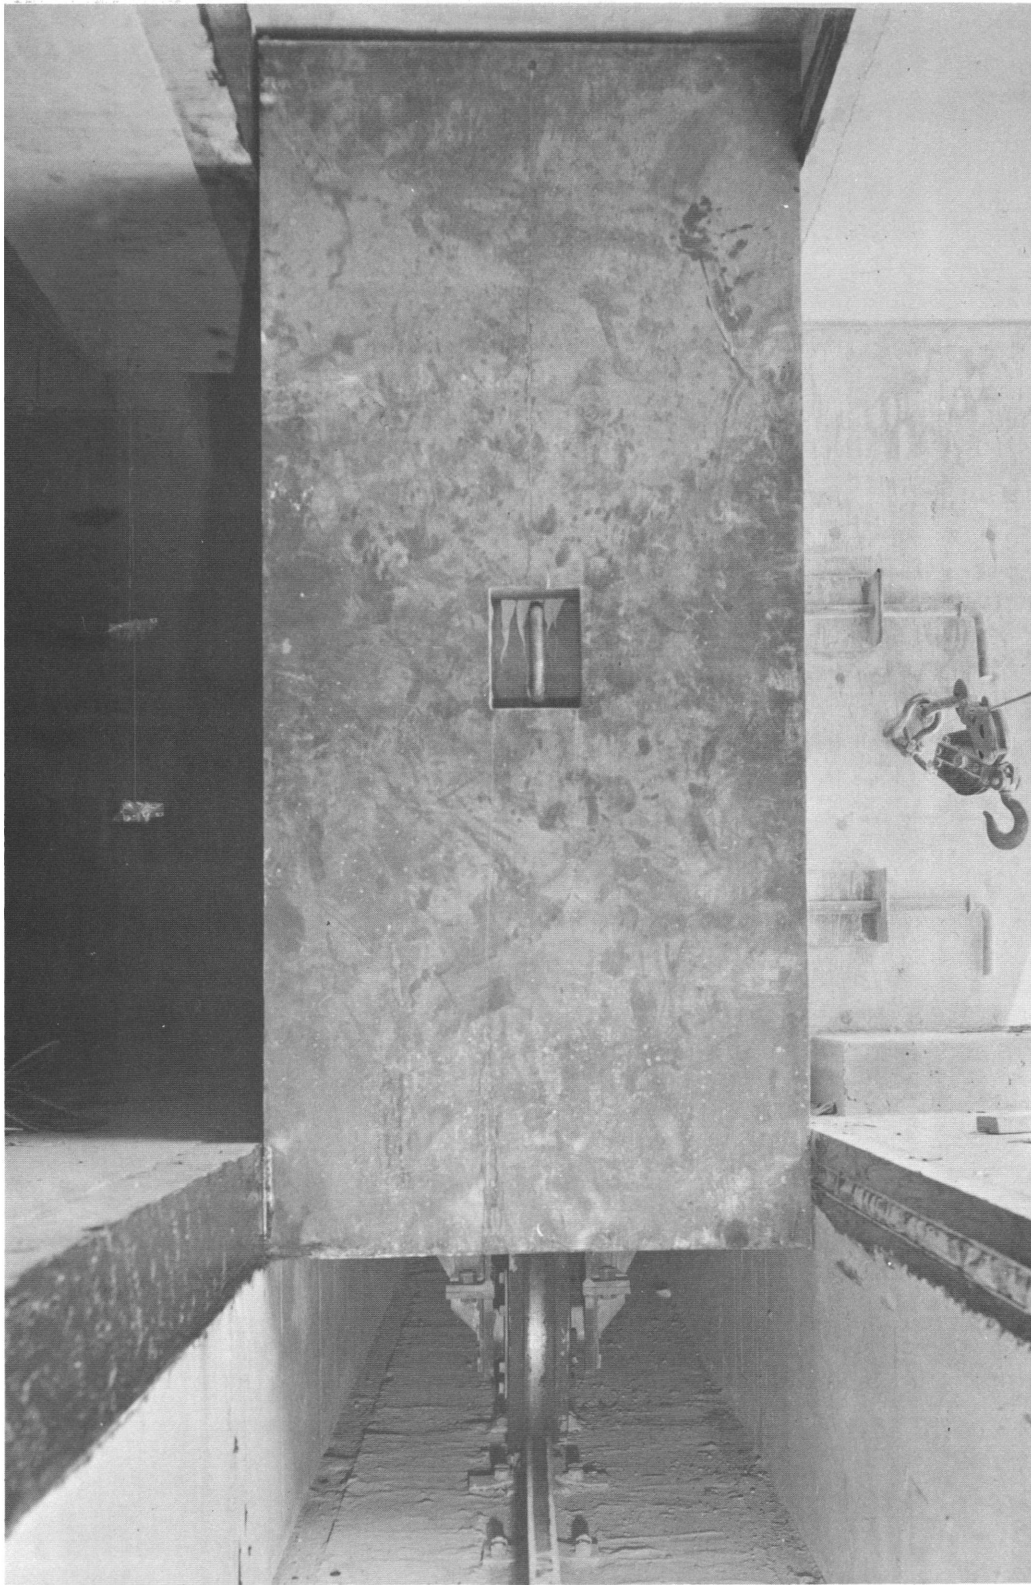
Wheel assembly and rails, door partly open, postshot.
